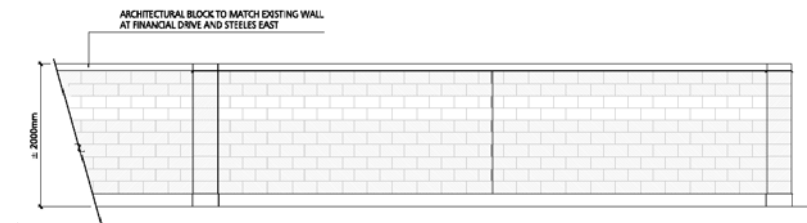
Commercial Retail Interface Wall Elevation
